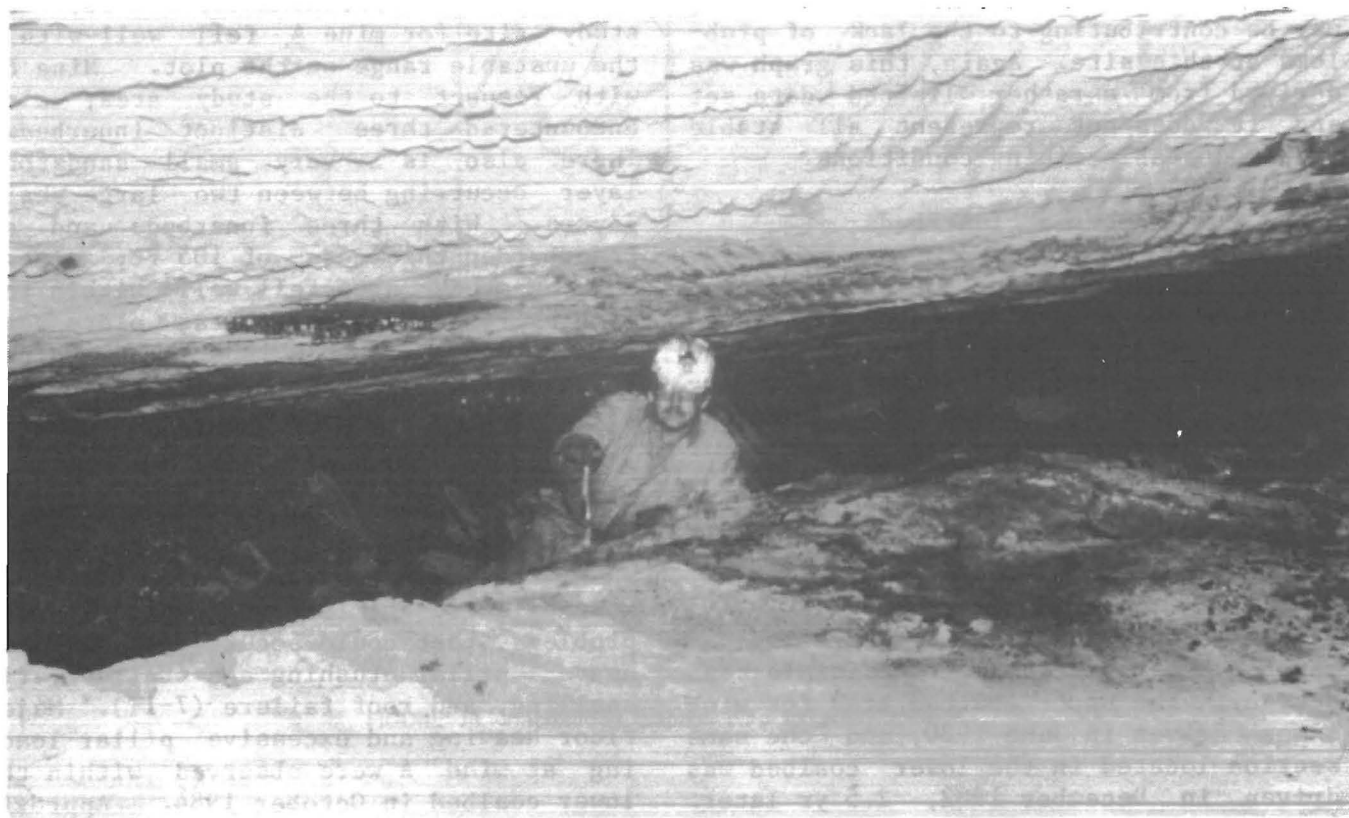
Major floor heaving and rib spalling occurring in the lower coalbed of study mine A.
